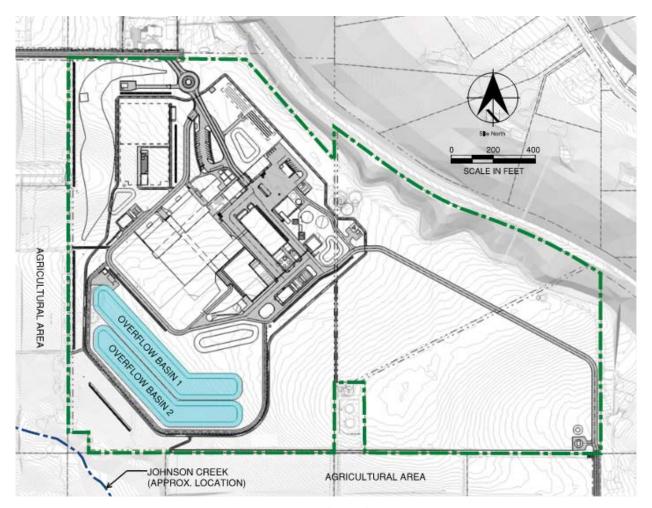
Filtration Facility Site Plan Showing Location of Overflow Basins
